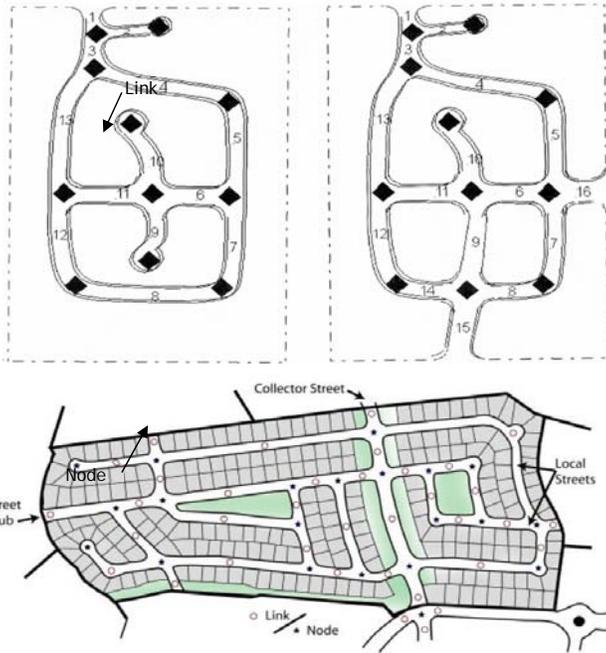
Examples of Street Connectivity Ratio as applied
